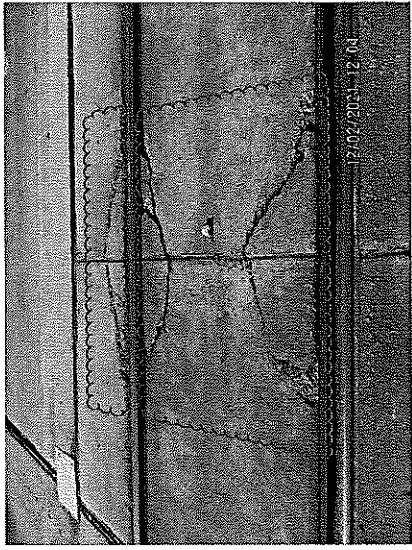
CEDAR ST. BRIDGE OVER I-35E
